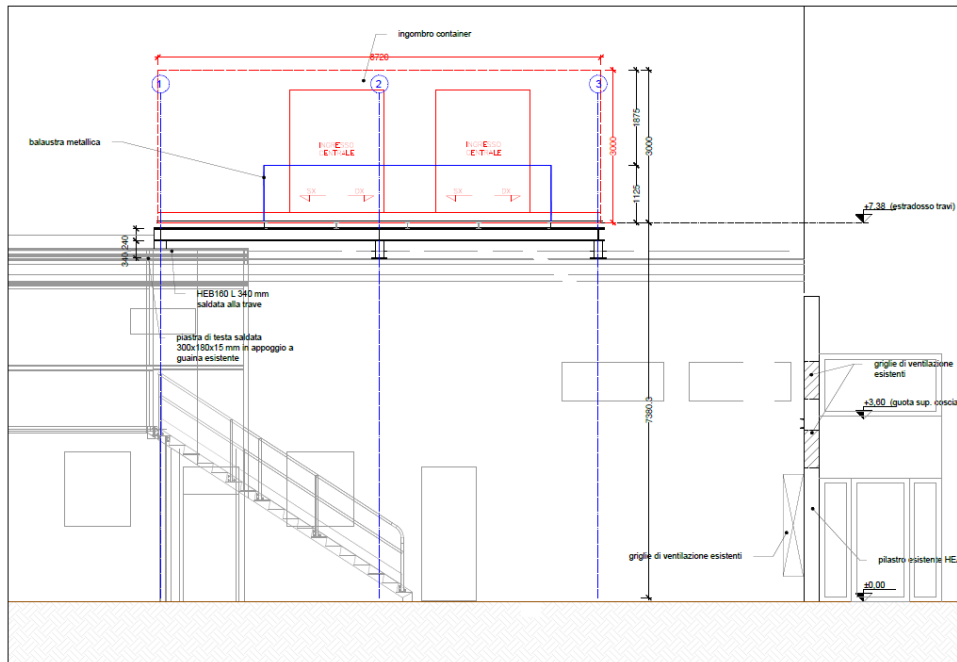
Implementation of the new raised geothermal plant - western side – current and future setup.
